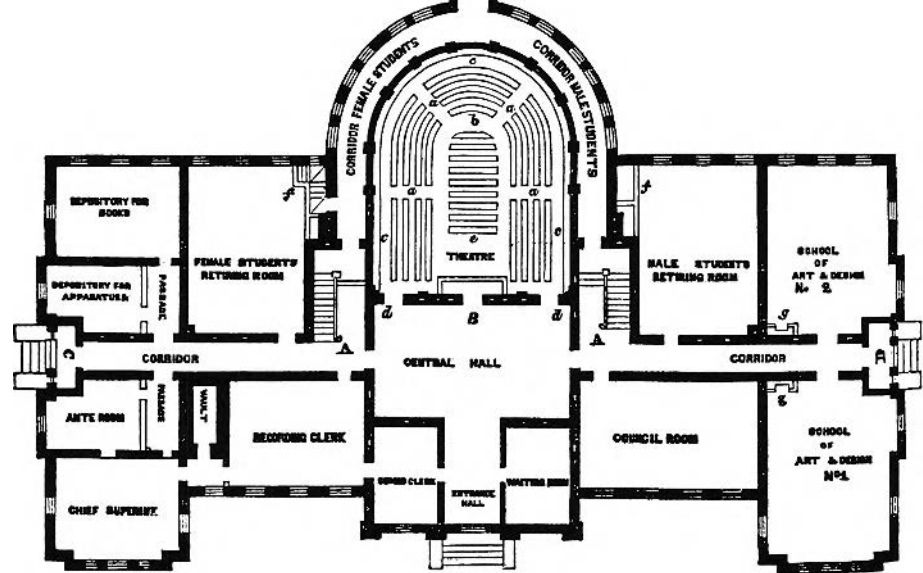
Plan of the Normal School Building, Toronto, c. 1851, Col. F.W. Cumberland and T. Ridout, architects (Photo: Legislative Library).
